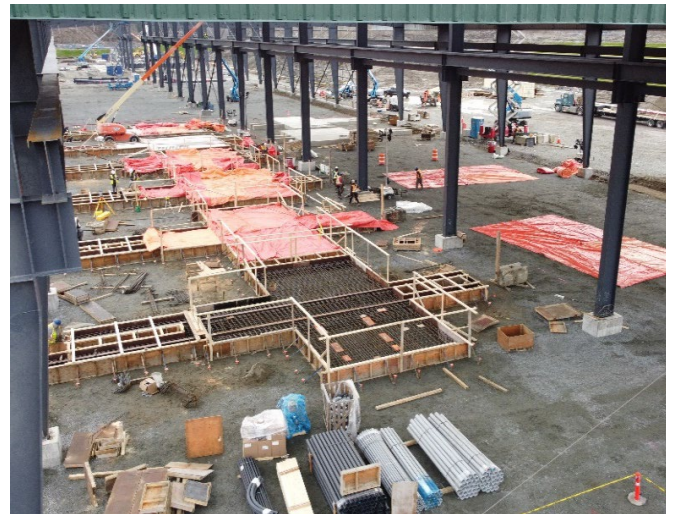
Ongoing construction of the production building at the precast concrete facility where the guideway segments will be produced and stored.
